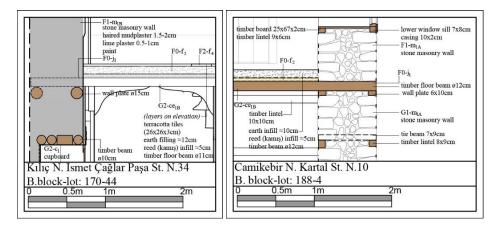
Connection detail 1-section drawing of floor beams inserted into wall along the wall thickness (left, Kılıç N. b. block-lot: 170-44; right, Camikebir N. b. block-lot: 188-4)
